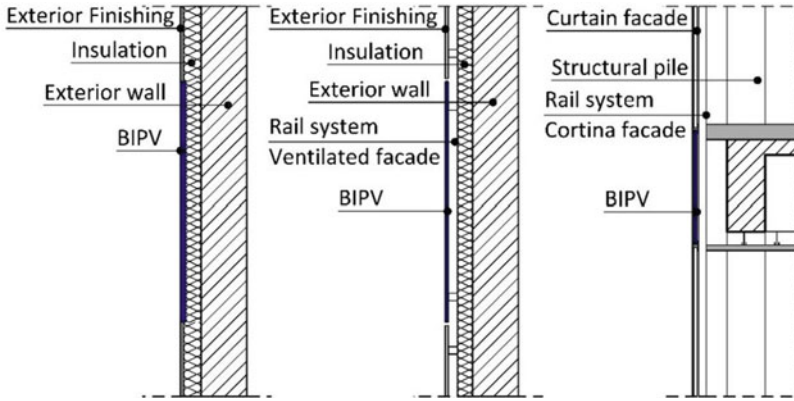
Vertical section through exterior wall presenting various situations of how BIPV can be integrated in a building façade. From the left: 1. integrated in façade plaster like finishing, 2. installed in a ventilated façade, 3. installed in a Curtain façade
